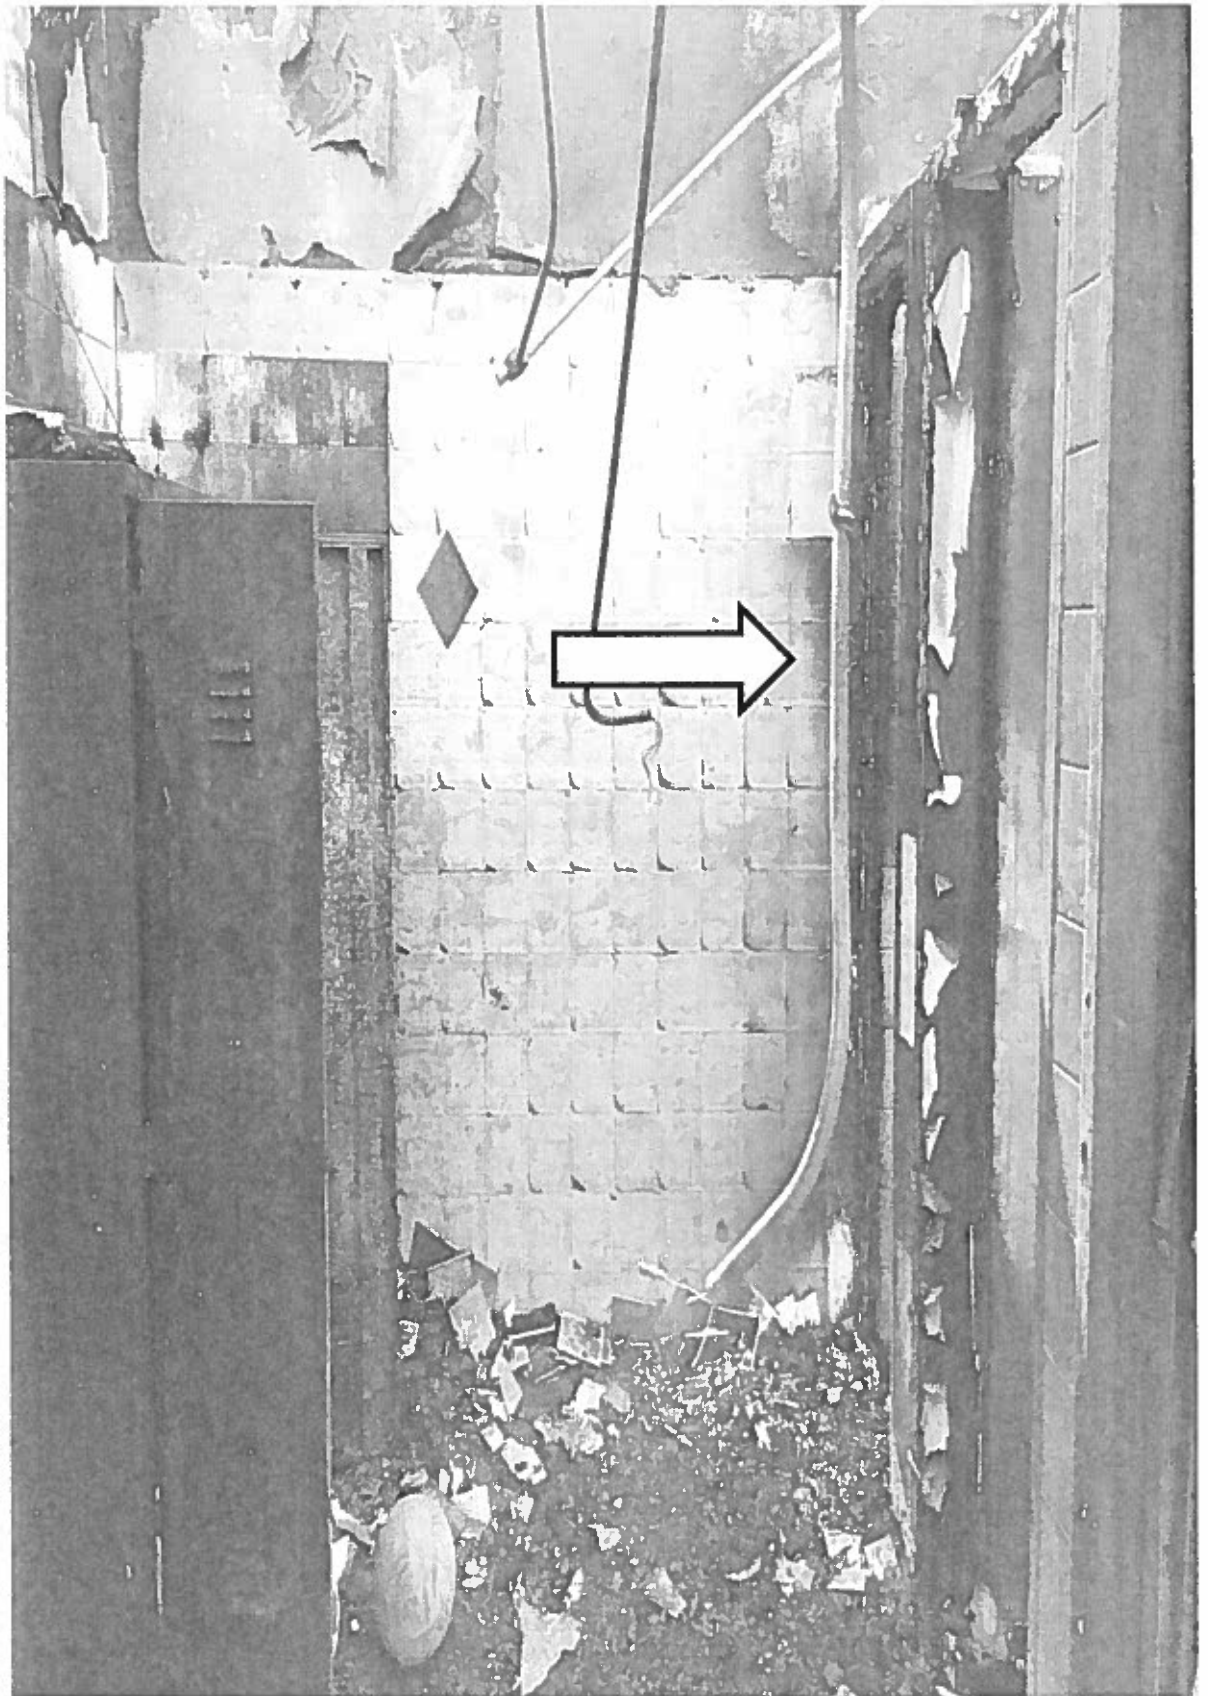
Damage caused by the fire to the first floor of the hostel
